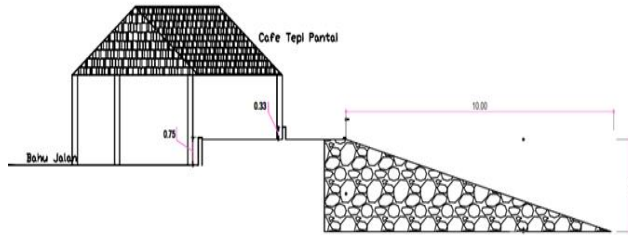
Slope of 1:5 recommended for seawall and embankment height of 0.5 m
